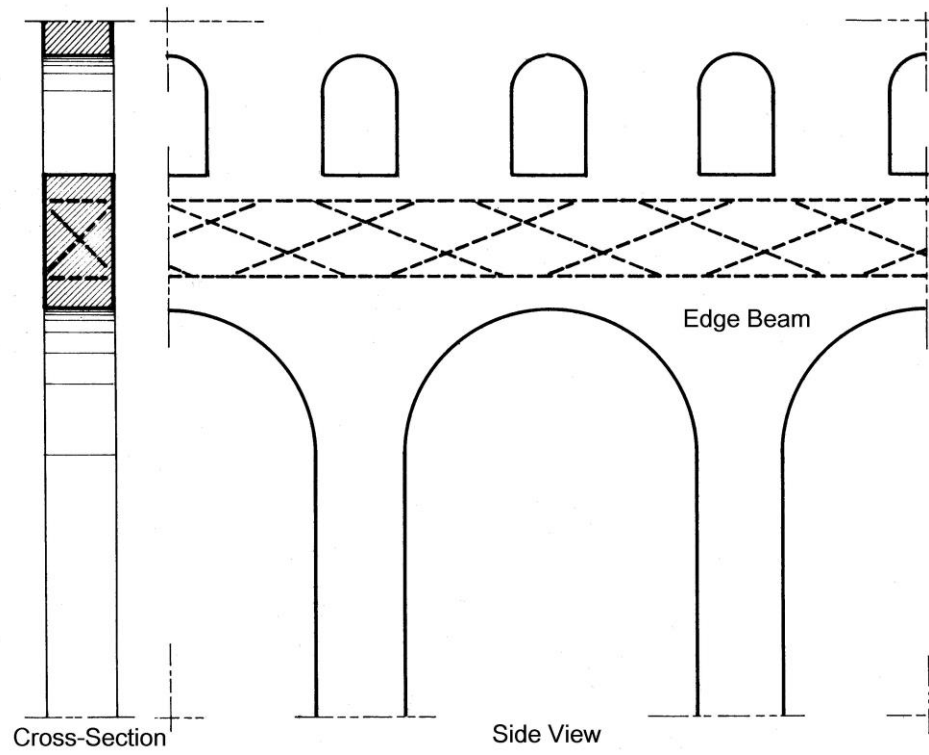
Edge Beam – Colonnade IRM Retrofit ².
